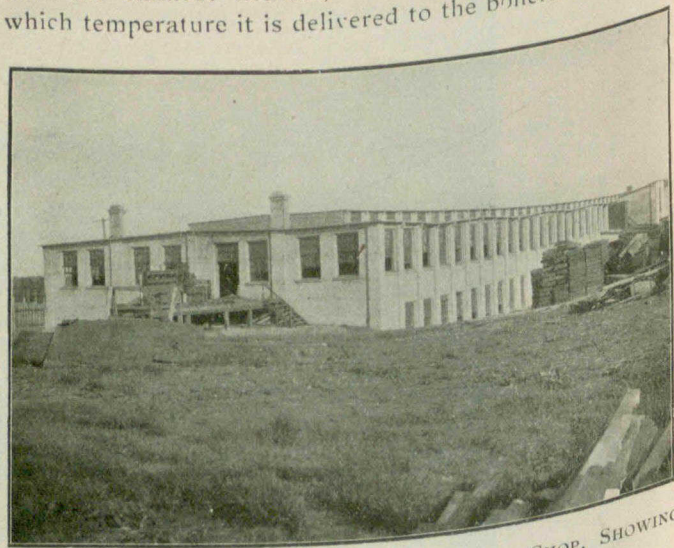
EXTERIOR VIEW OF STOVE MOUNTING SHOP, SHOWING CONCRETE CONSTRUCTION.
